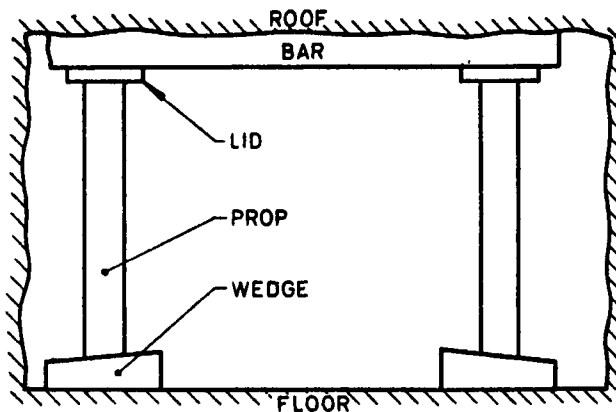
TWO PROPS SUPPORTING A BAR IN A HEADING OR A ROADWAY
